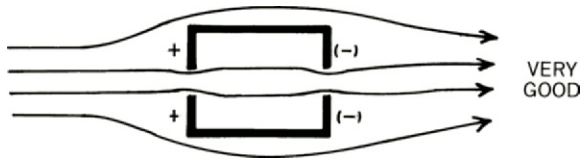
Cross ventilation between windows on opposite walls is the ideal condition.
